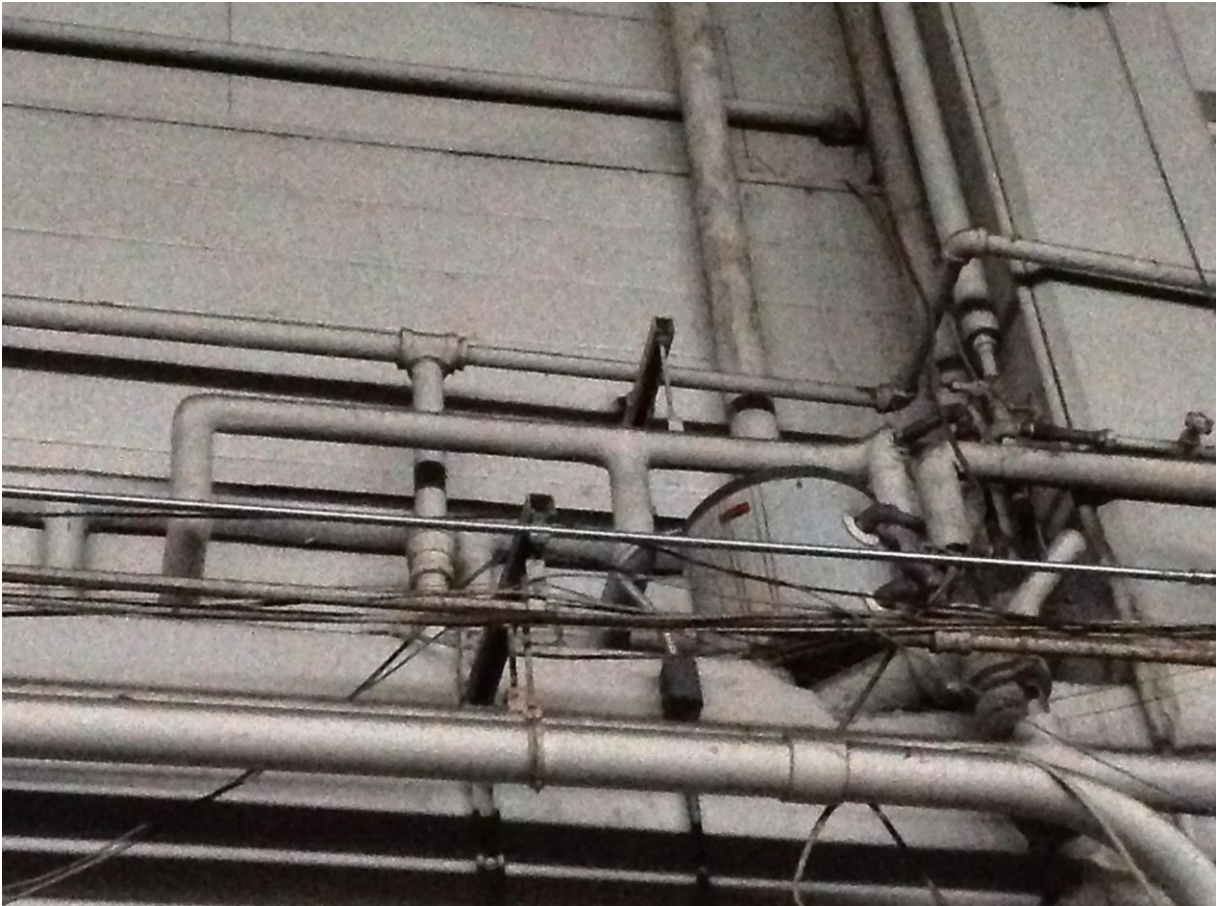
Asbestos-containing thermal system straight pipe/joint insulation (water).
